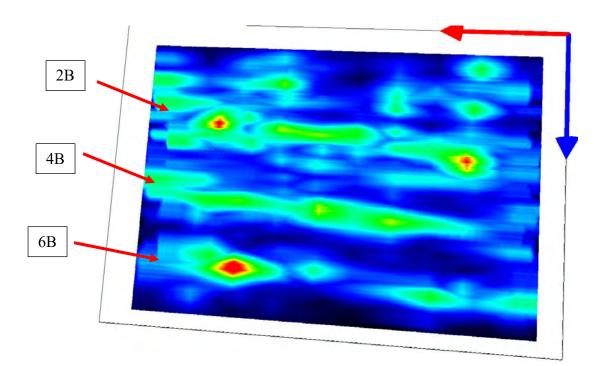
Cable ducts north girders, 17,5 meters in.
